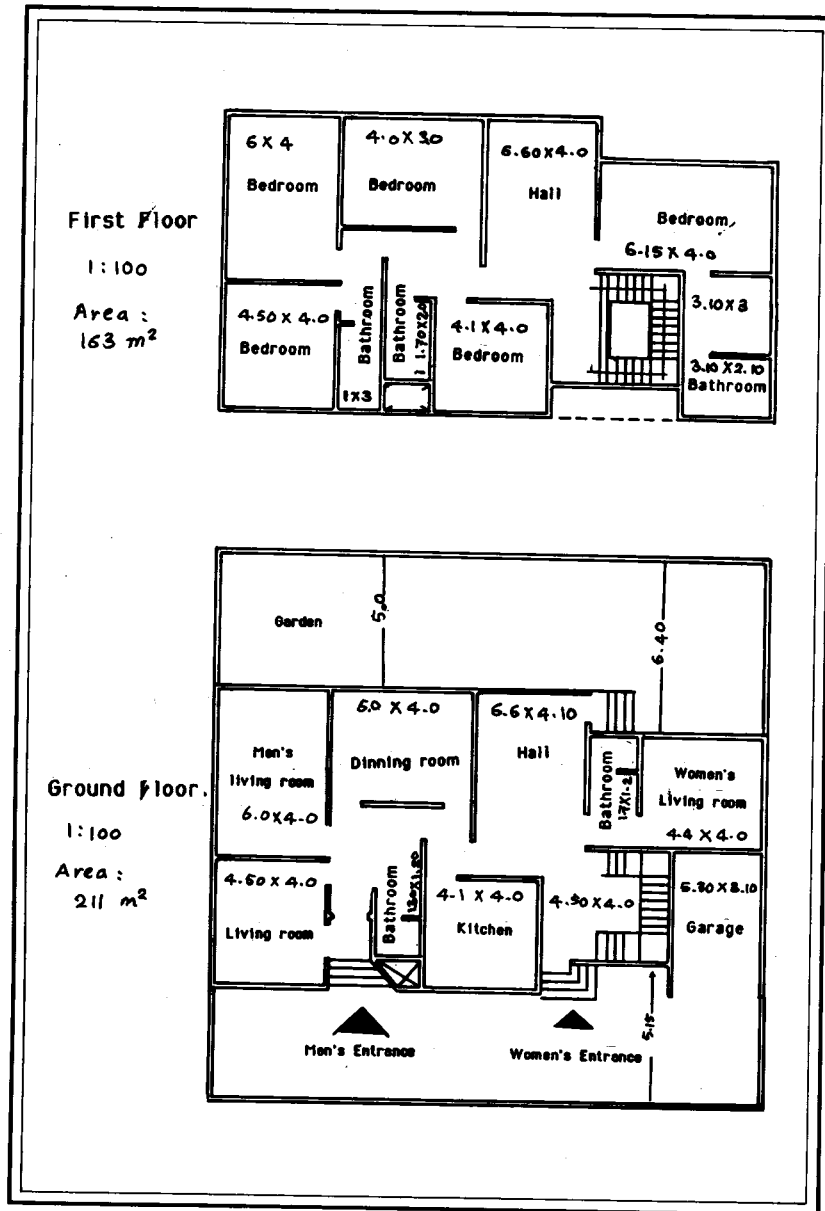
House plan (No. 7). Source: Uraija submunicipality.
